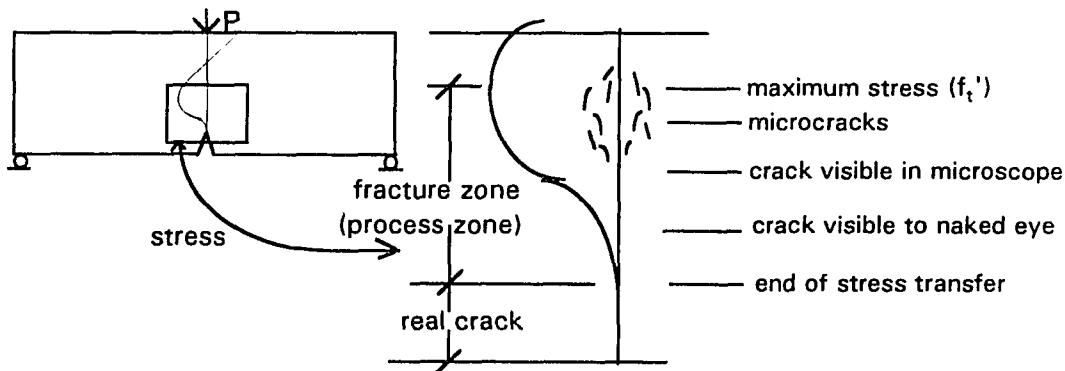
A Loaded Concrete Beam with a crack and a fracture zone. No well-defined crack tip exists.
